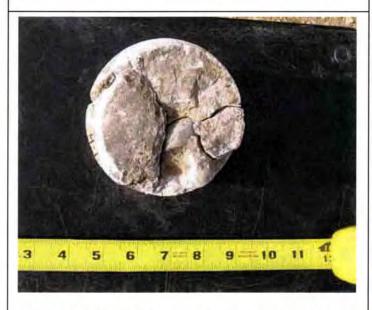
Core 4, Segment 1 - Top of core shows significant cracking.
